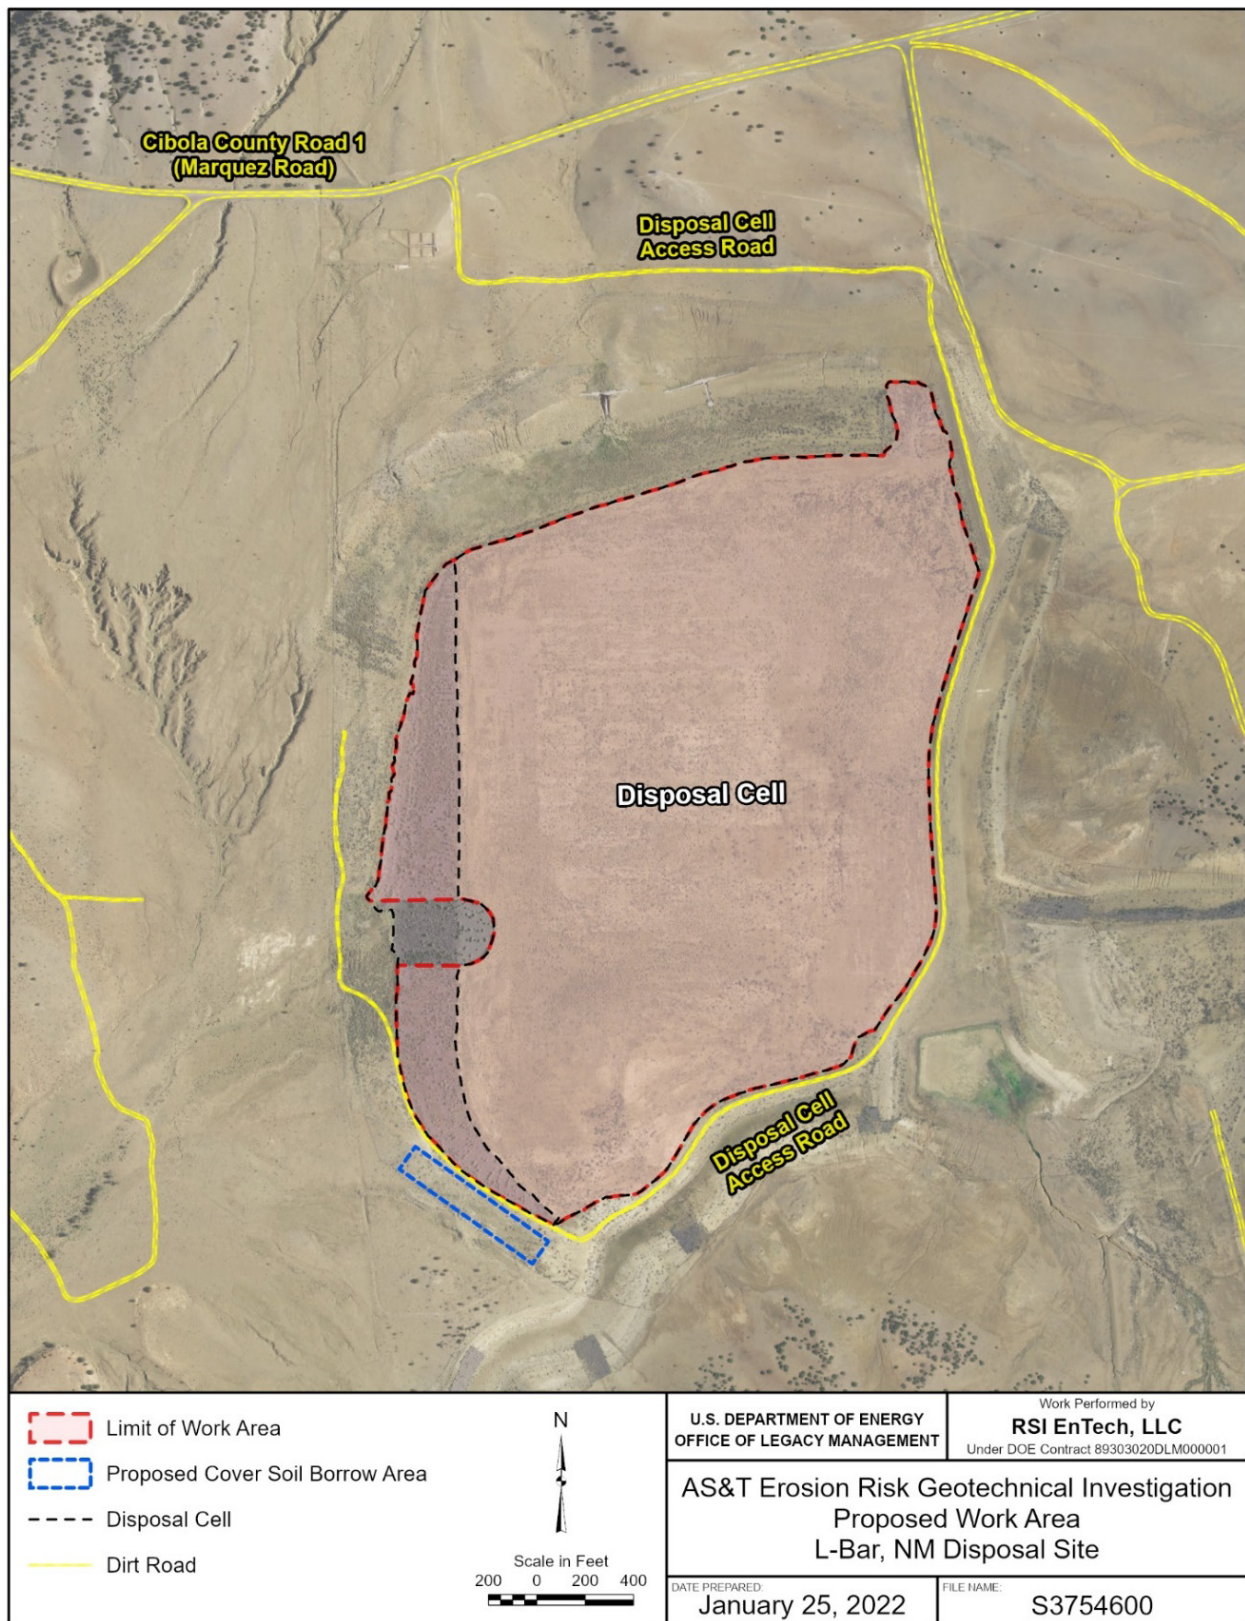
Proposed Work Area at the L-Bar, New Mexico, Disposal Site
